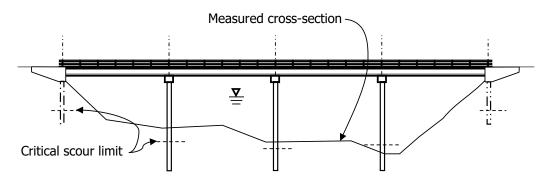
Elevation view showing critical scour limits and stream cross-section for a bridge.
